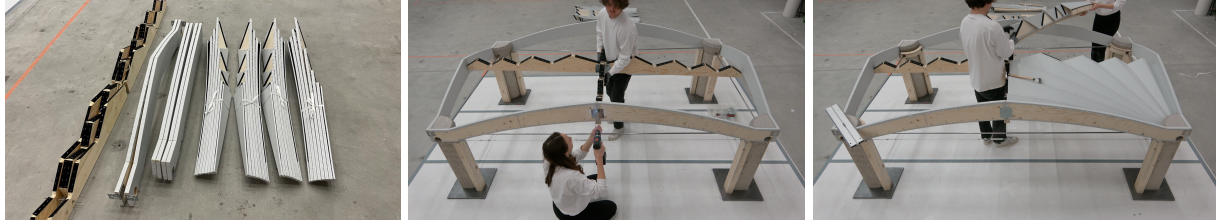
On-site assembly of the formwork: (a) kit of parts, (b) formwork frame, and (c) deployment of the CCU quarters
